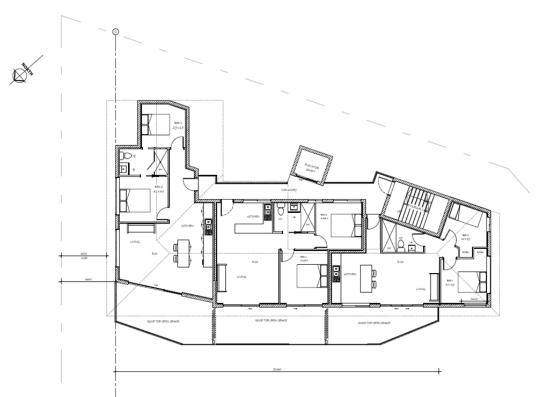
Proposed Apartment Second Floor Plan (3 apartment rooms)
